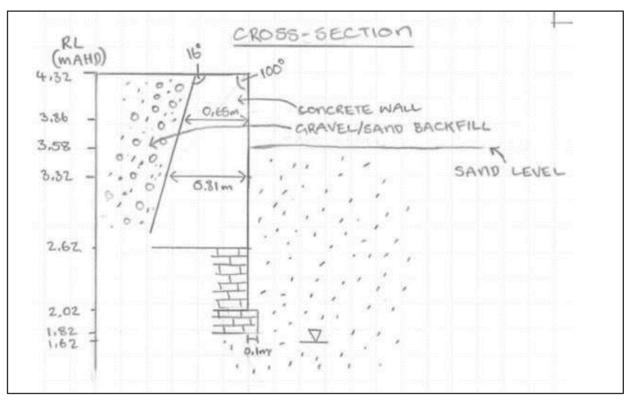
Sketch of interpreted representative seawall cross section for the northern-most 100 m of the Bronte Seawall which includes that fronting the SLSC (source: (ARUP, 2016))
